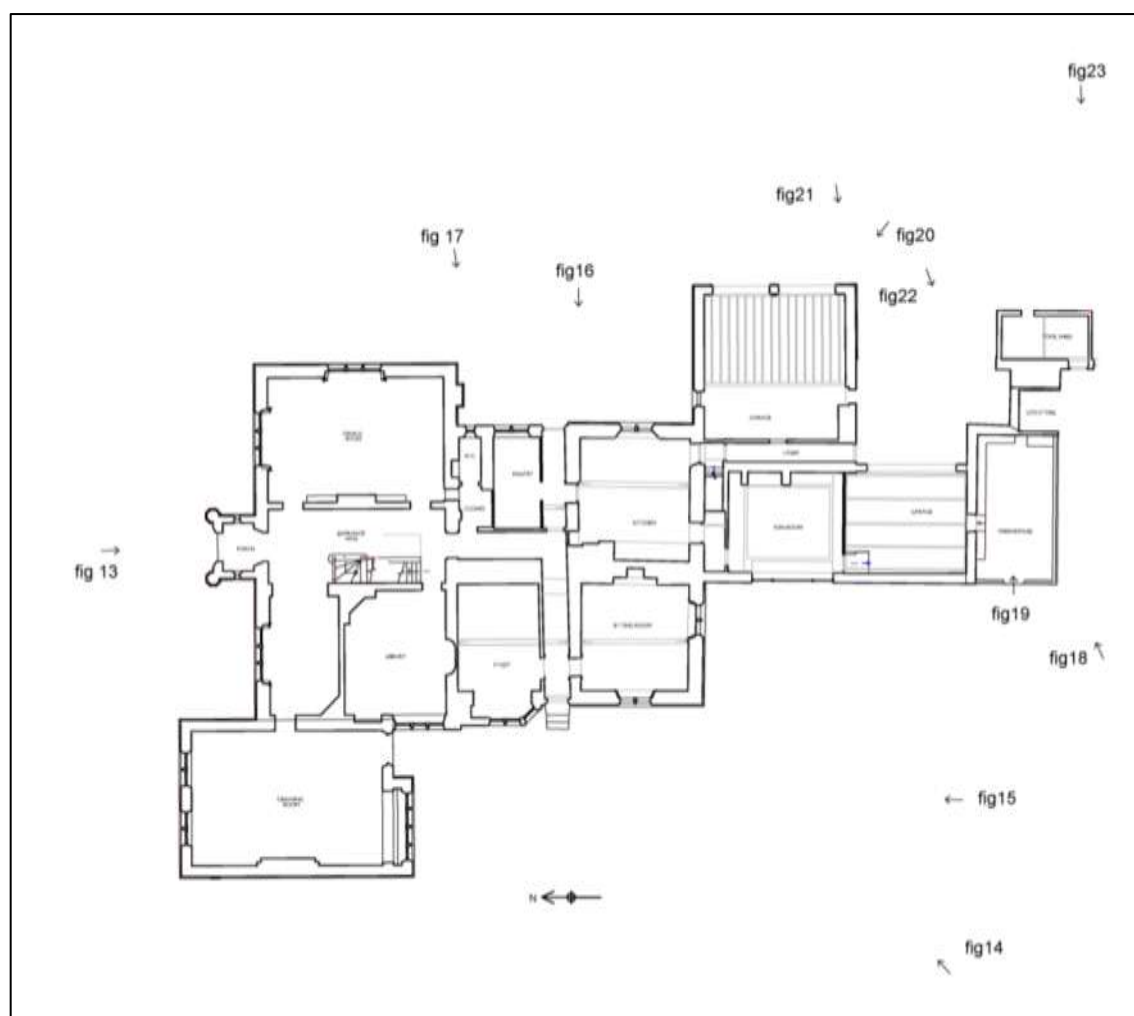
Location of external photographs (figs 13-23) on ground floor plan.
